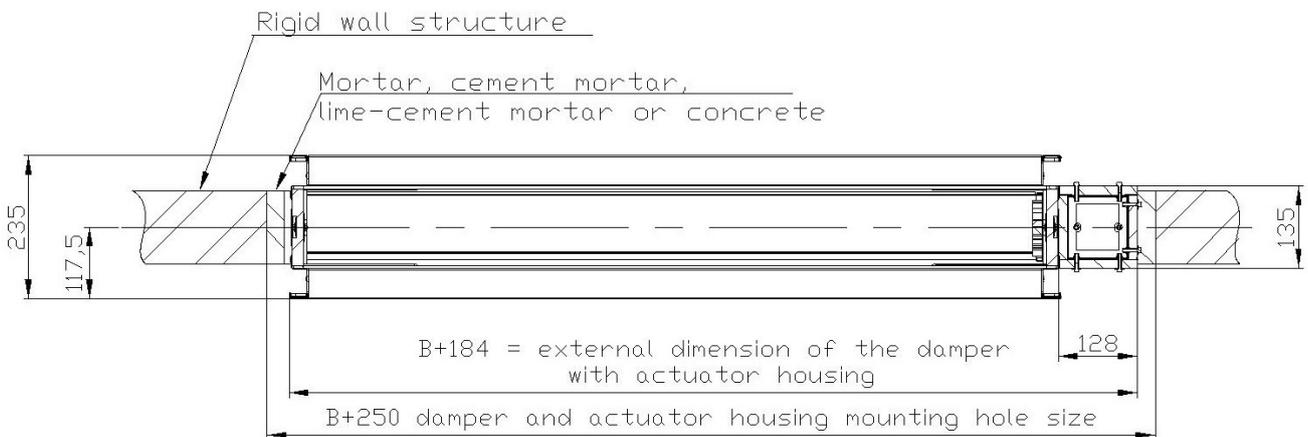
Installing method of WKP-O fire dampers in rigid wall
